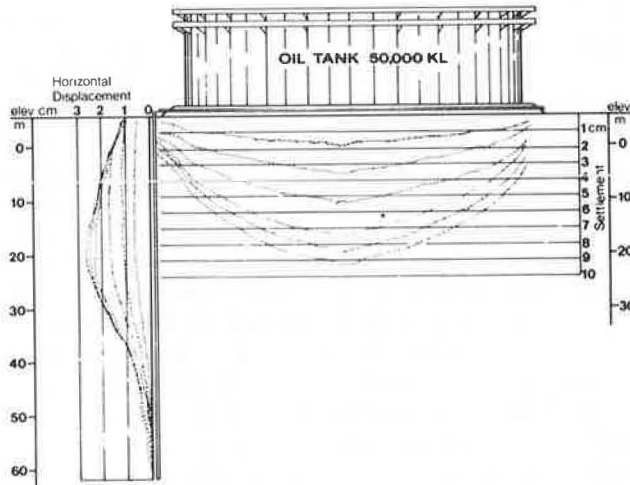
Vertical and horizontal monitoring of an oil tank foundation during water test loading (4).
